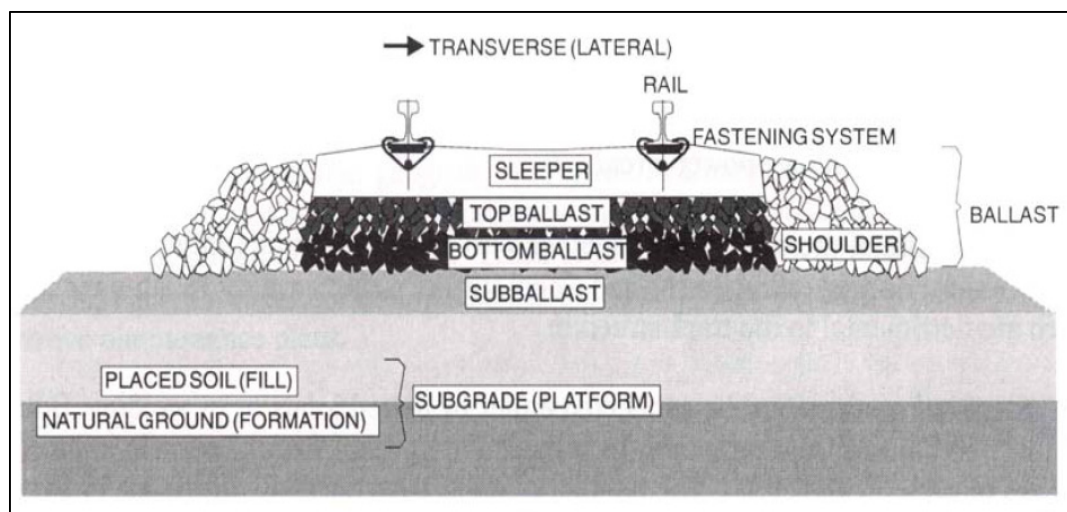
Cross sectional layout of a typical ballasted track (Selig & Waters, 1994)
